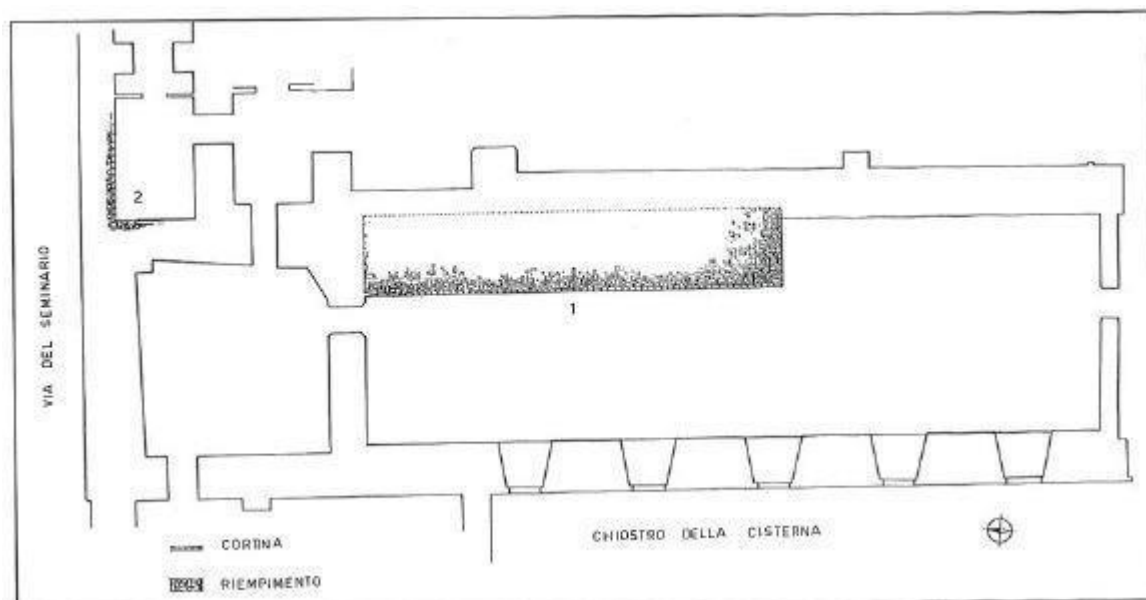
Plan of wall R1 (indicated with number 1), found in the basement of Palazzo del Seminario/Seminario building (Alfano 1998, 179).
